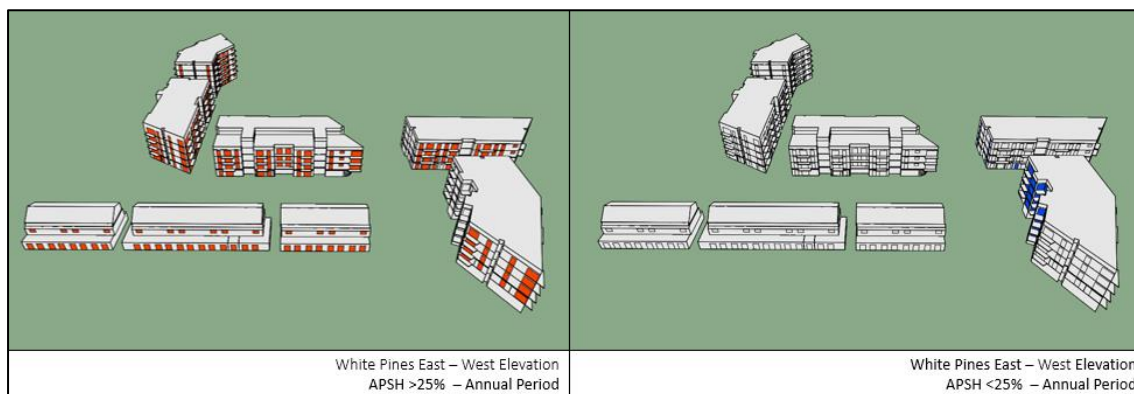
APSH Annual Period (BRE Recommended Benchmark) – West Elevation
